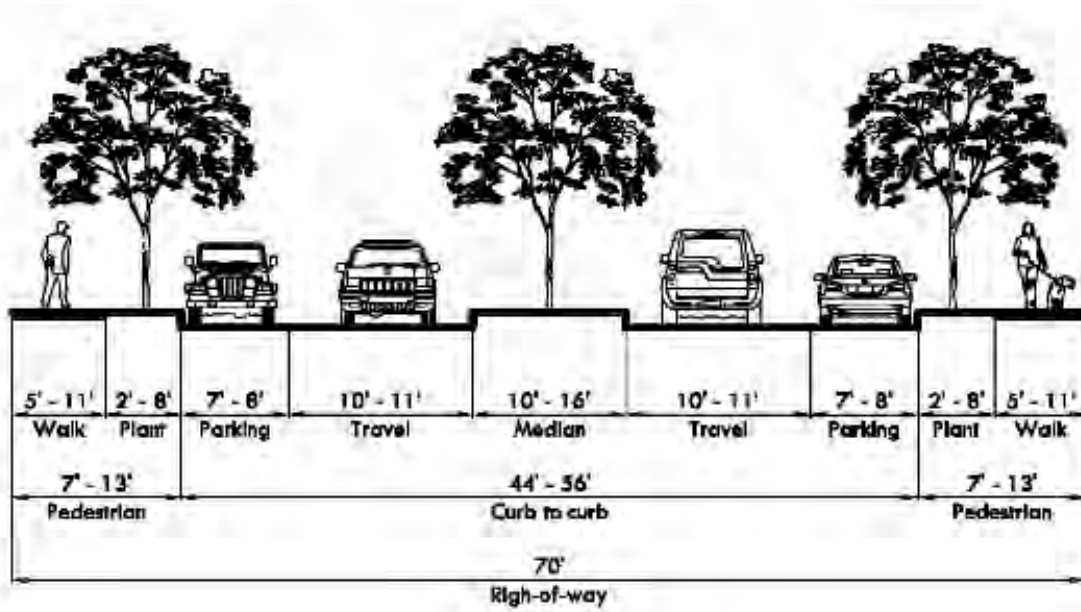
Typical “B” Street with 60’-70’ Right-of-Way Section
